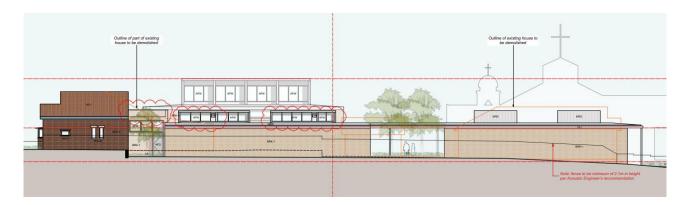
Proposed Southern Elevation including 2.1m high acoustic fence
